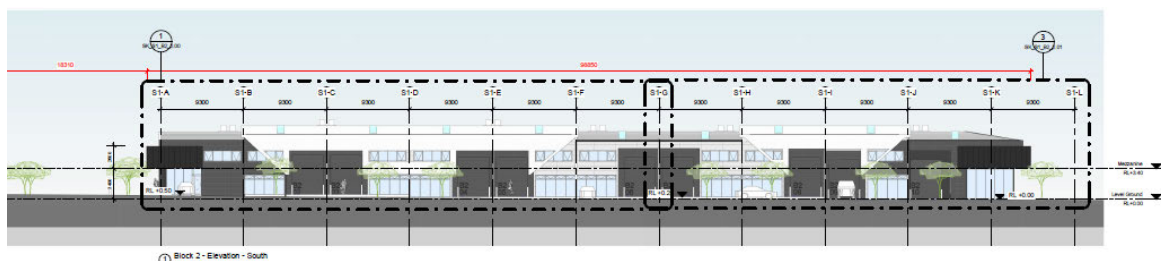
LOT B WAREHOUSE DEVELOPMENT, SOUTHERN ELEVATION
